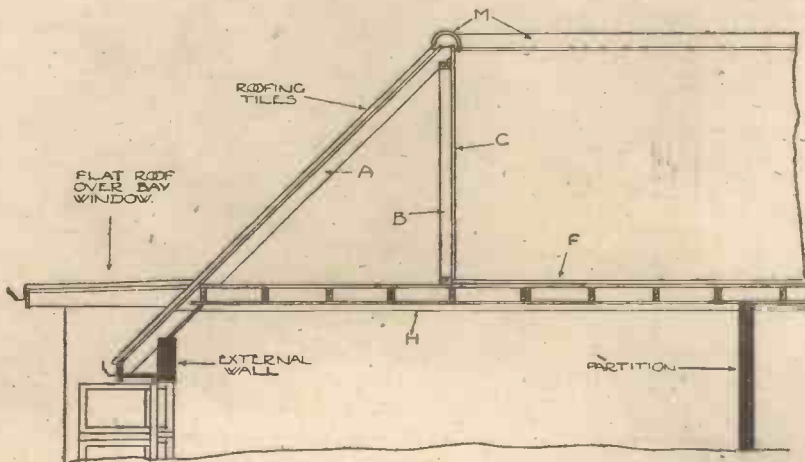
ALTERNATIVE METHOD OF CONSTRUCTING EAVES WITH ROOF EXTENDING A LITTLE INTO ROOM
